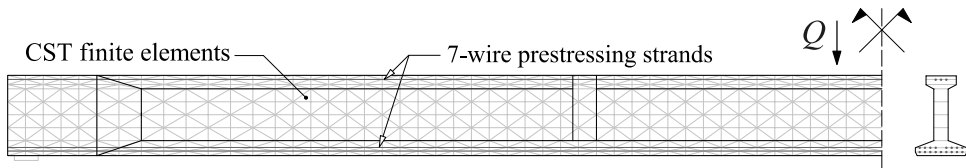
Structural modelling and finite element discretisation of PC bridge deck beam without top RC slab (MCFT).
